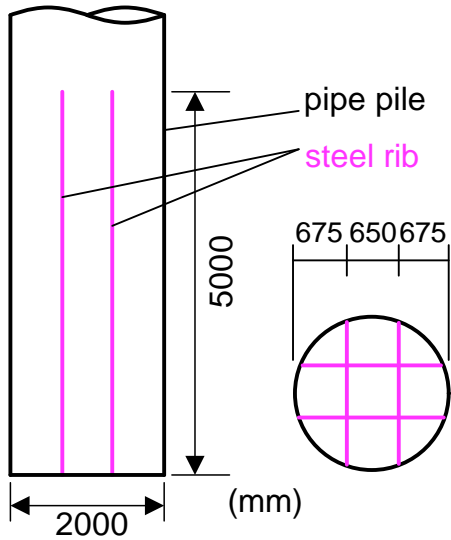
Steel pipe pile with double crossed steel ribs at the bottom section.
